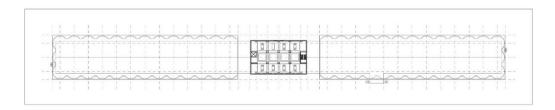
Plan drawing. The floor was not accessible (Author, 2021).
